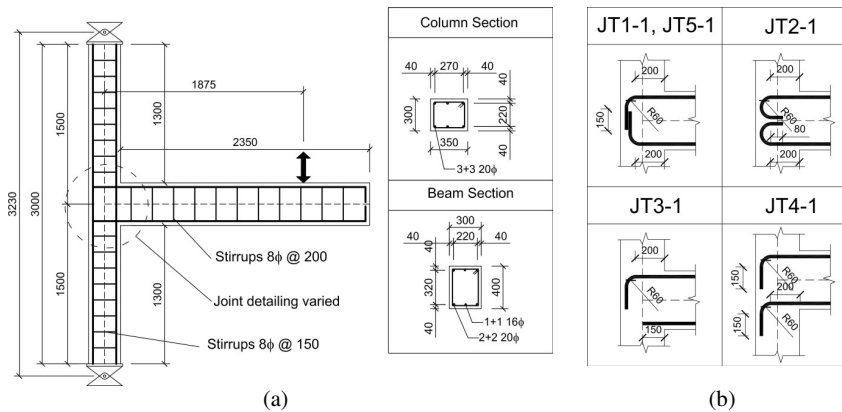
a) Test setup and geometry of the specimens; b) detail of the anchorage of the beam bars in the joint panel (all dimensions in mm)
